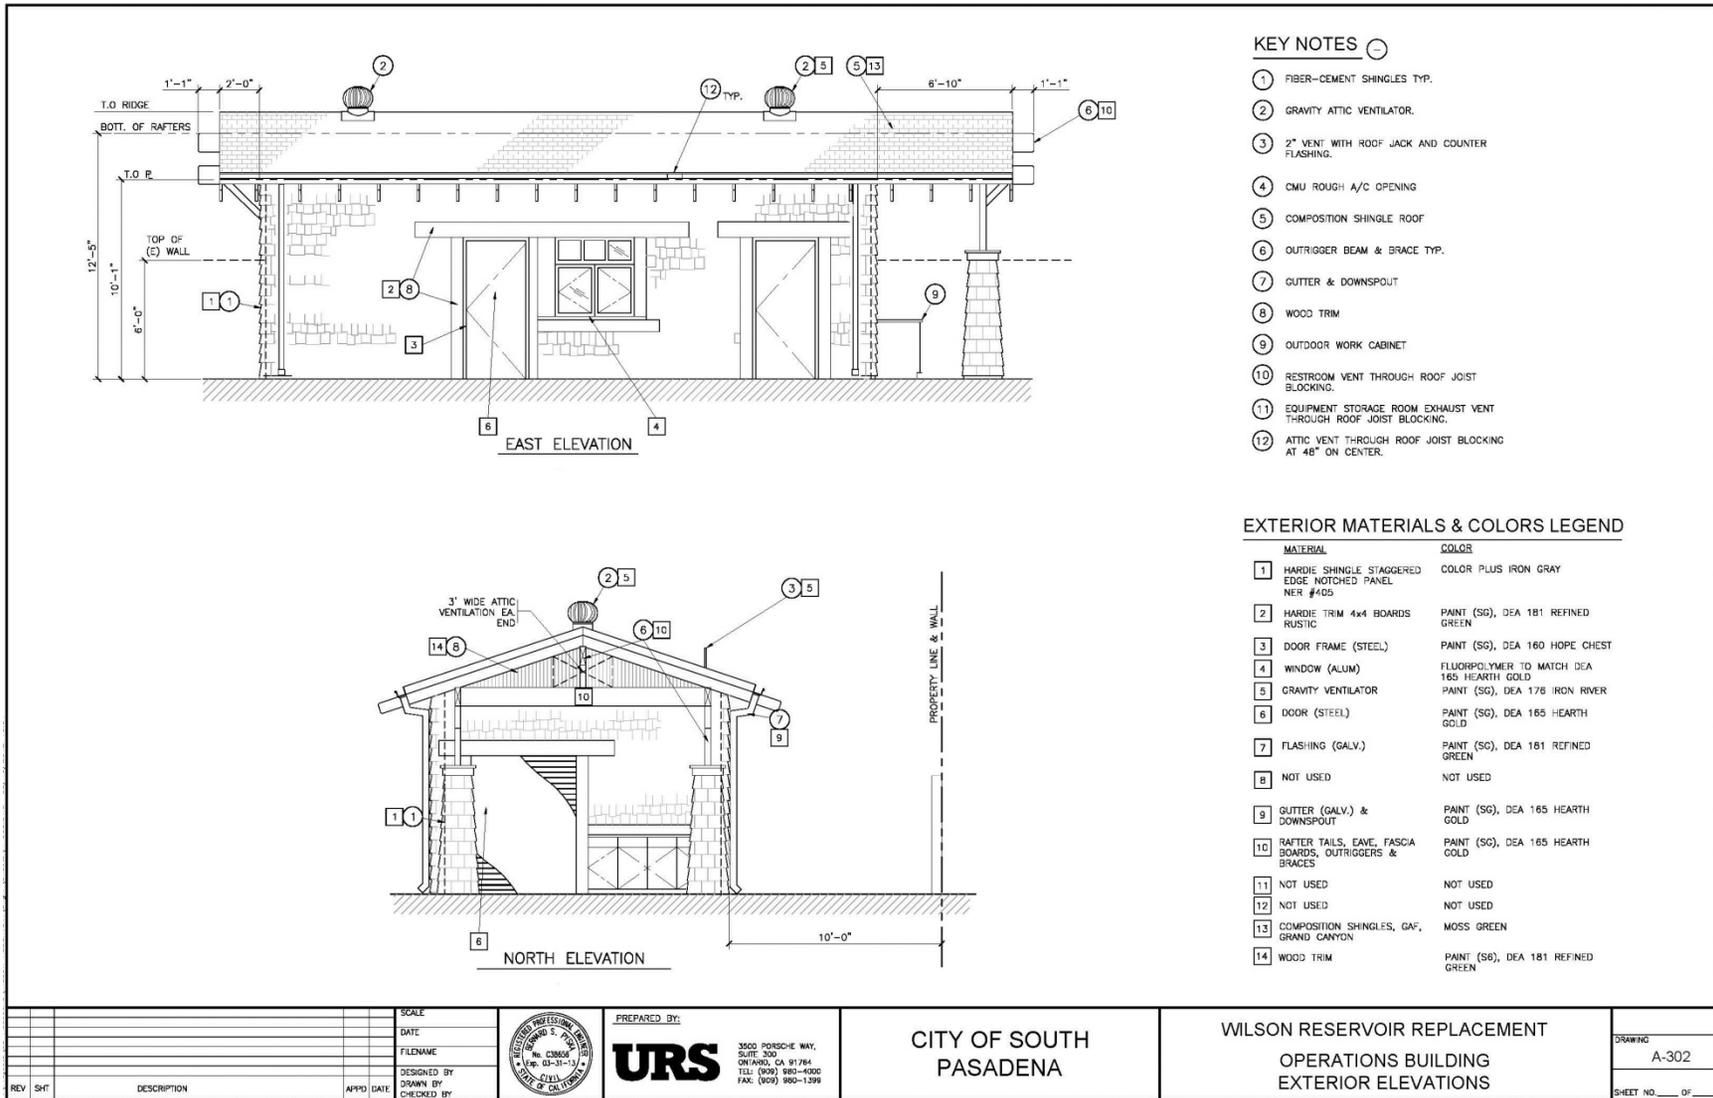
Proposed Operations Building Exterior Elevations (pg. 1)
